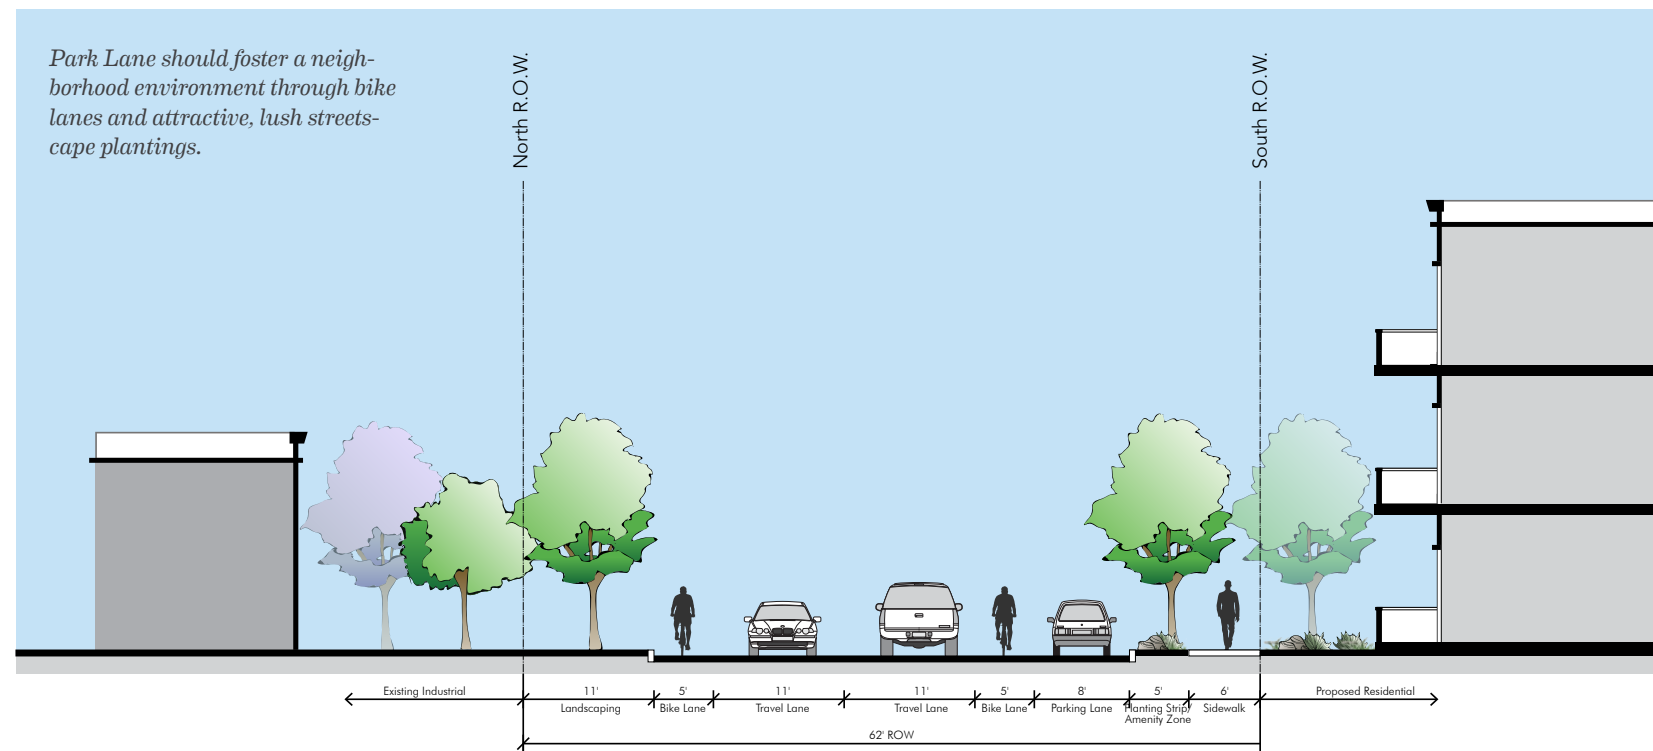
PROPOSED PARK LANE STREET SECTION
